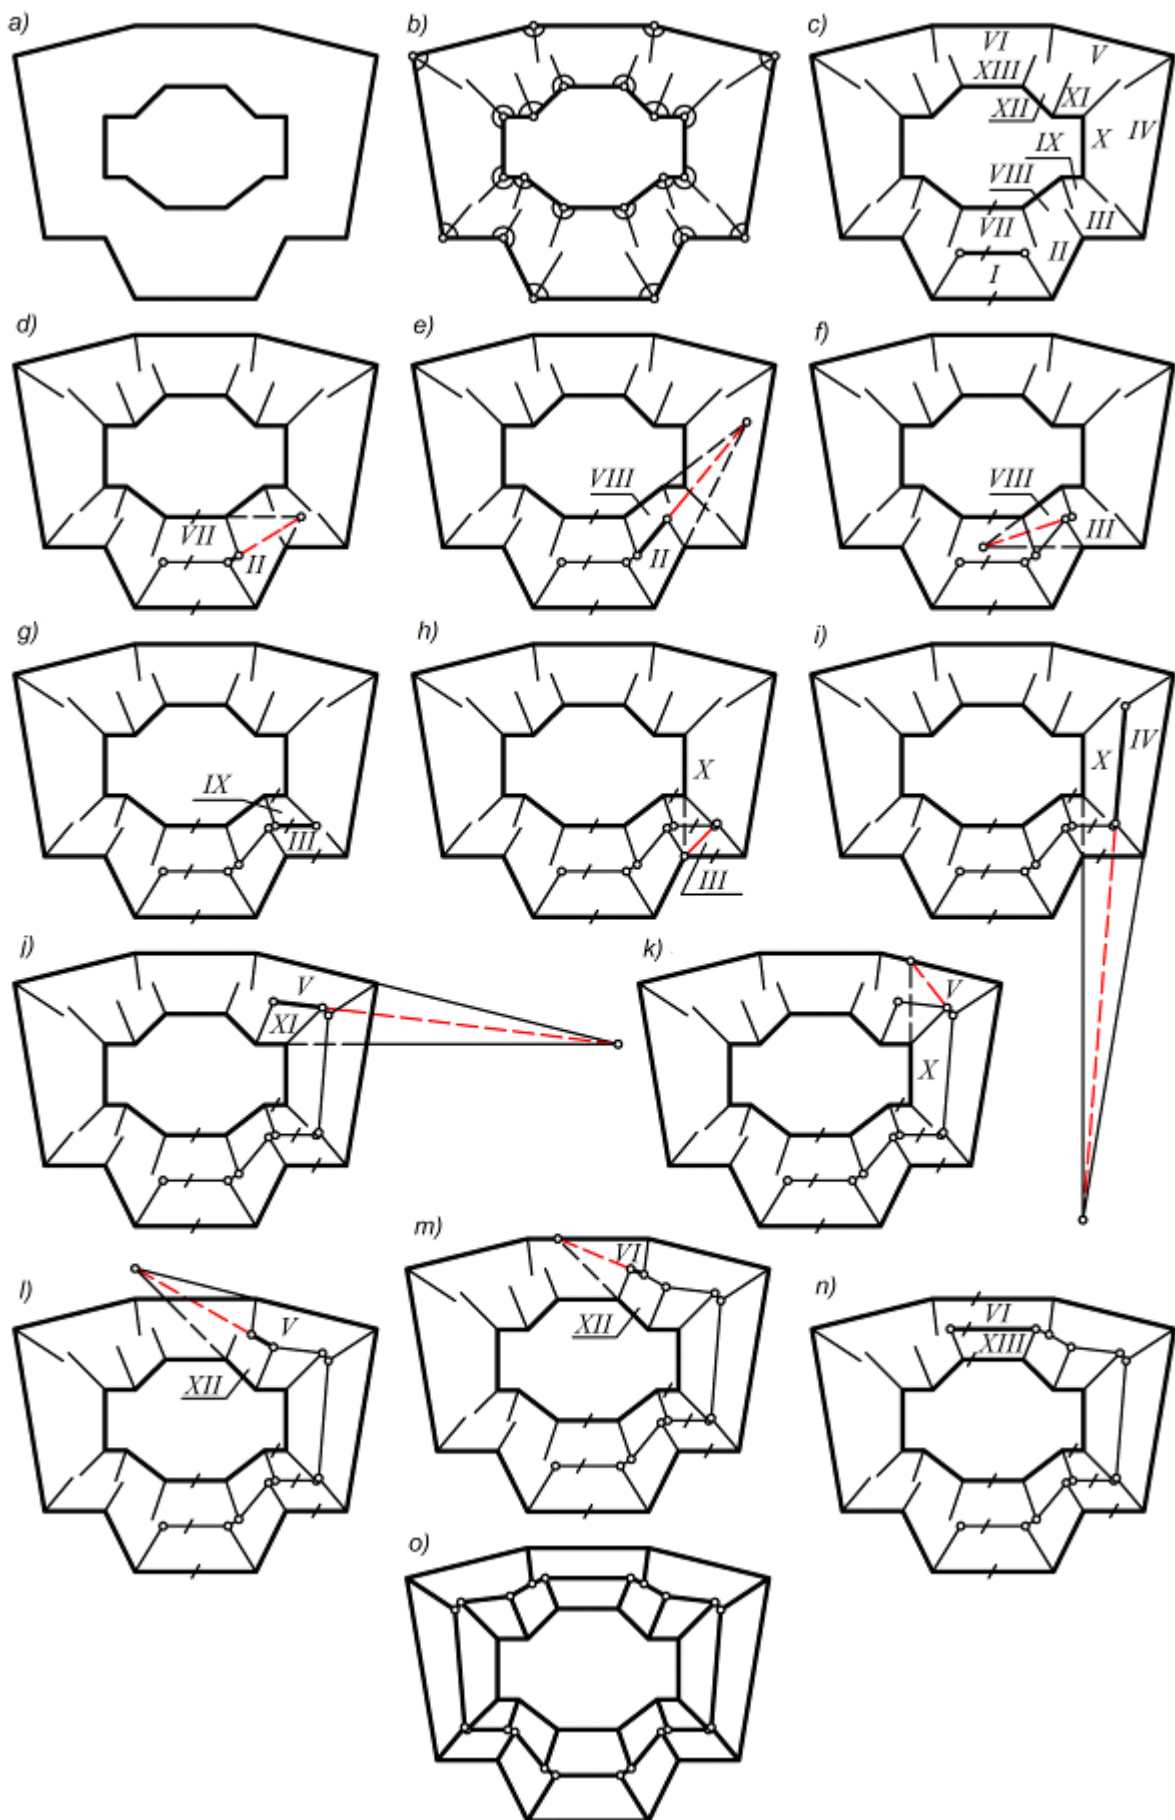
Stages of construction of the intersection of the roof slopes of the building with the inner courtyard
